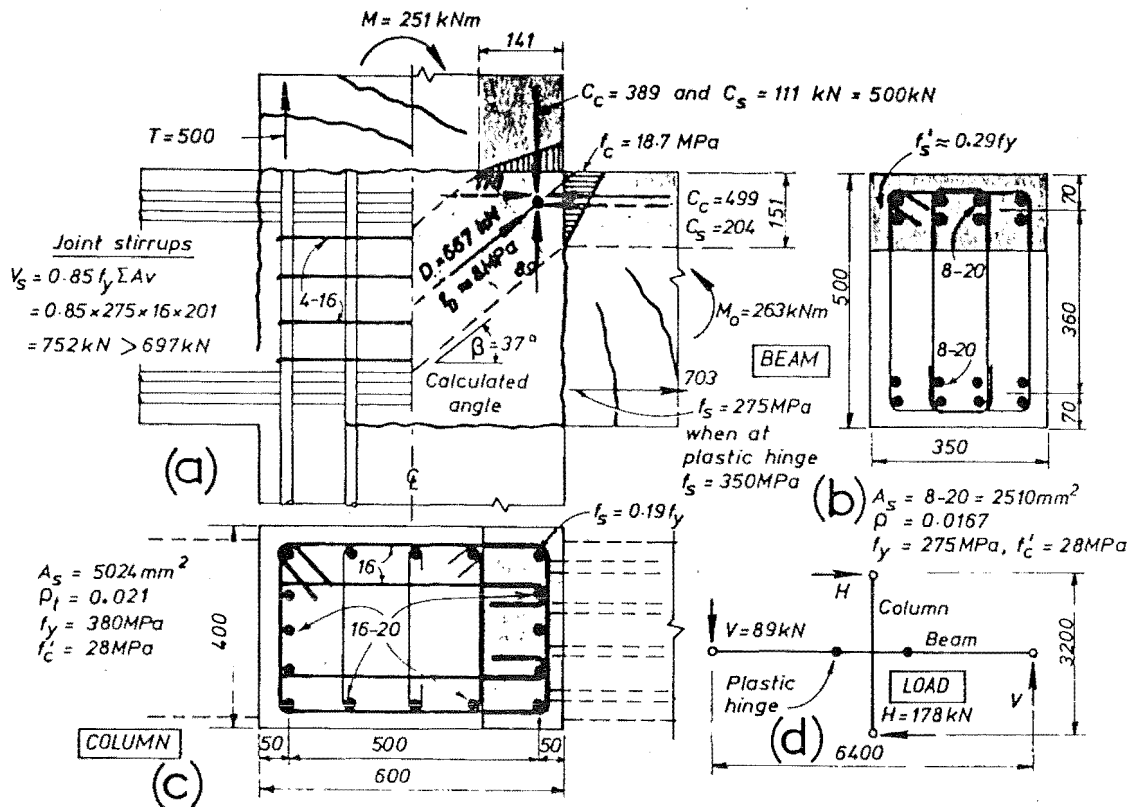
THE DISPOSITION OF FORCES AT AN 'ELASTIC' BEAM-COLUMN JOINT
